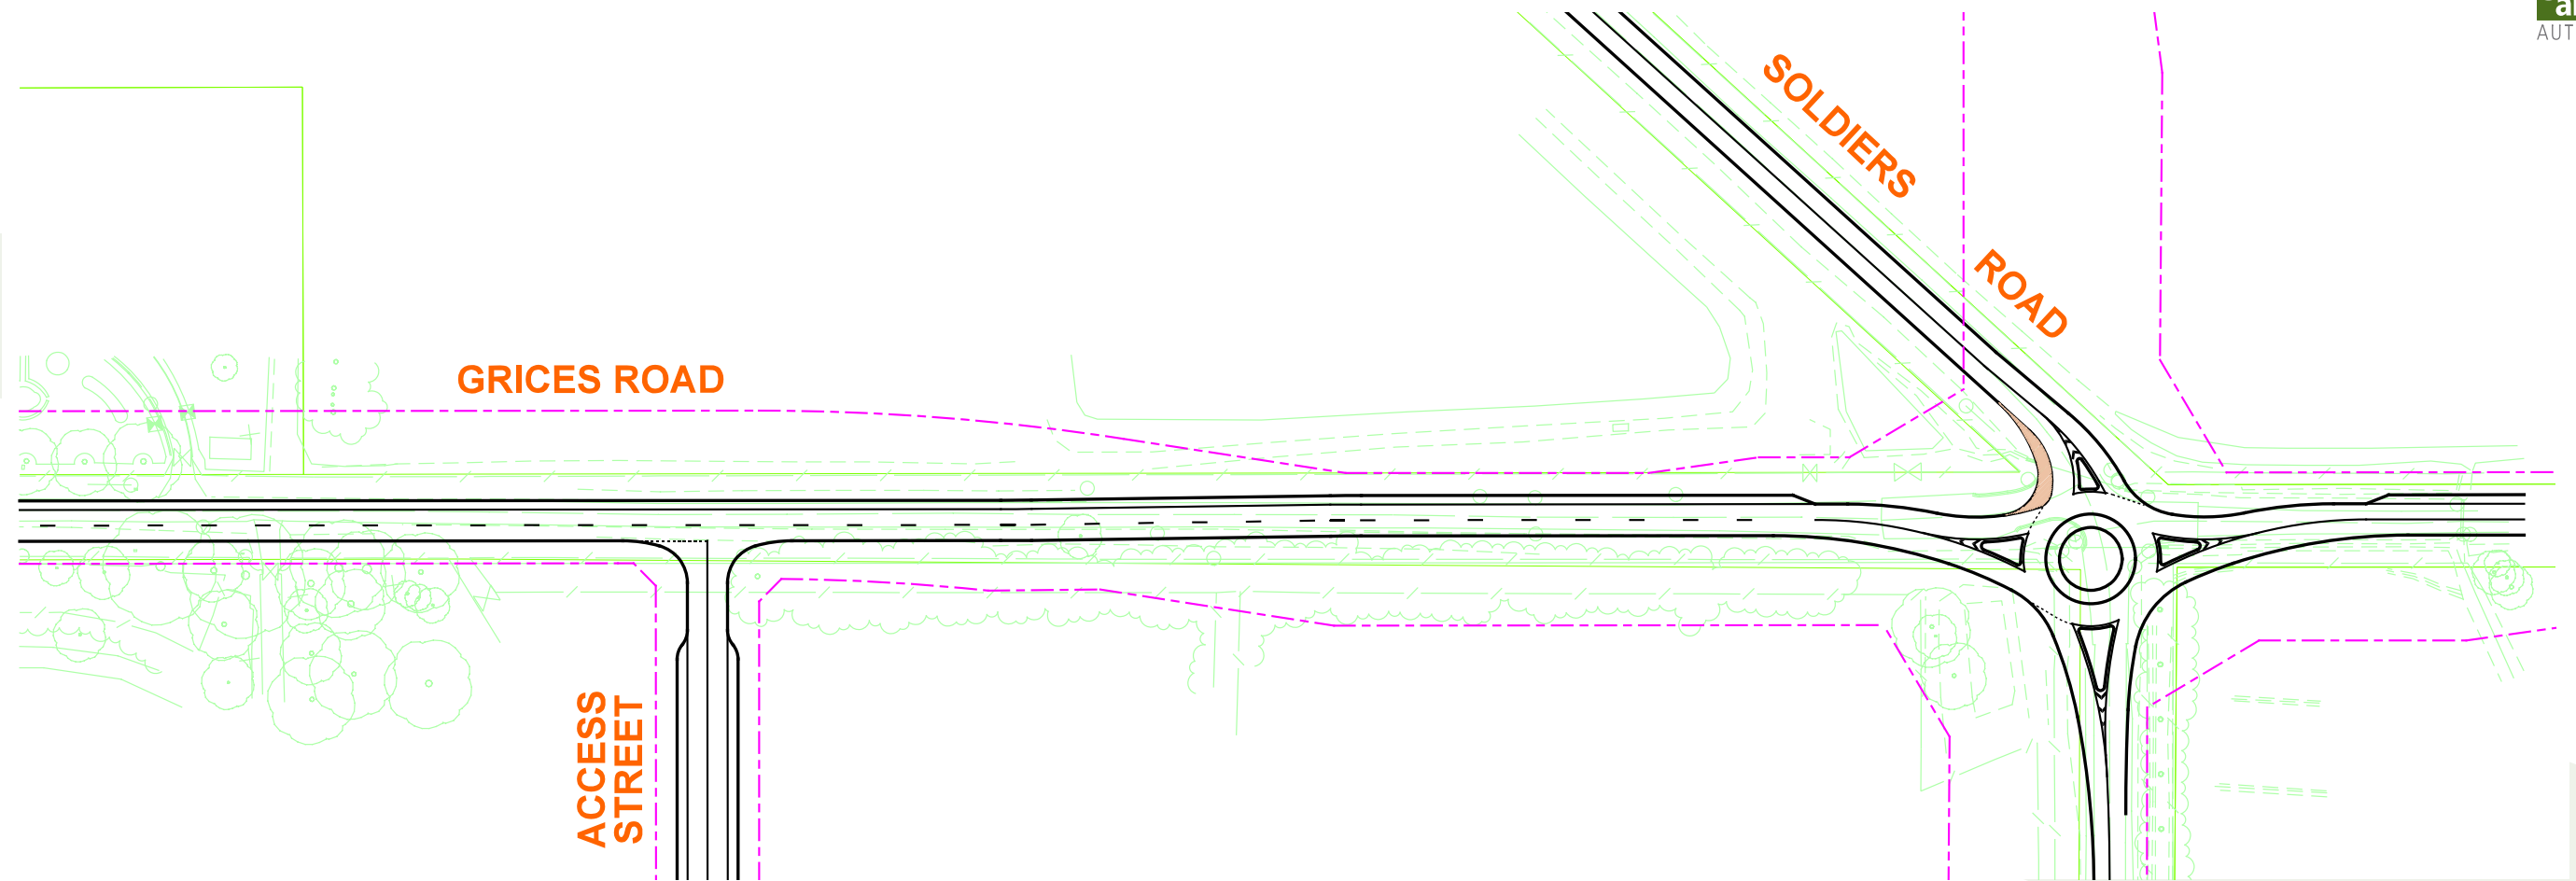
Intersection of Grices Road and Soldiers Road (Eastern Section)
